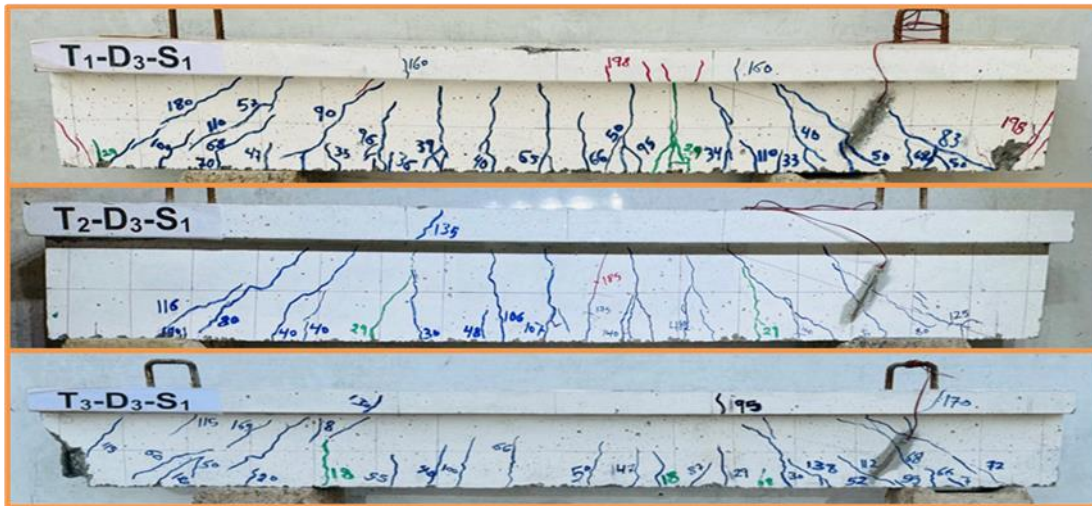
Crack patterns and failure modes for T-beams reinforced with steel bar of 16 mm
